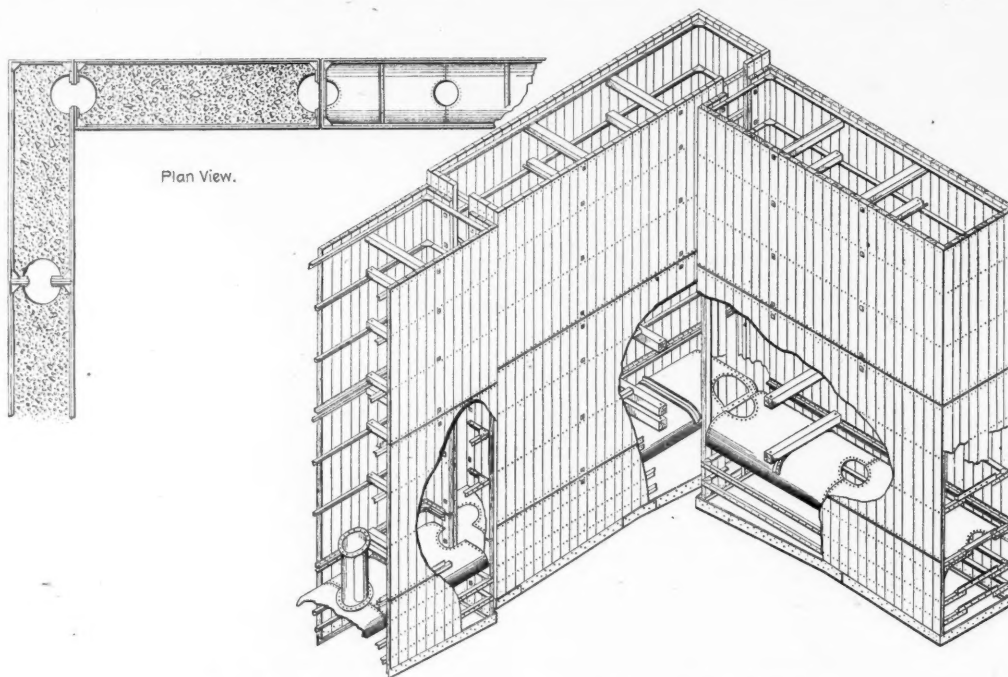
Isometric Drawing and Plan of Caissons "D" and "E."
